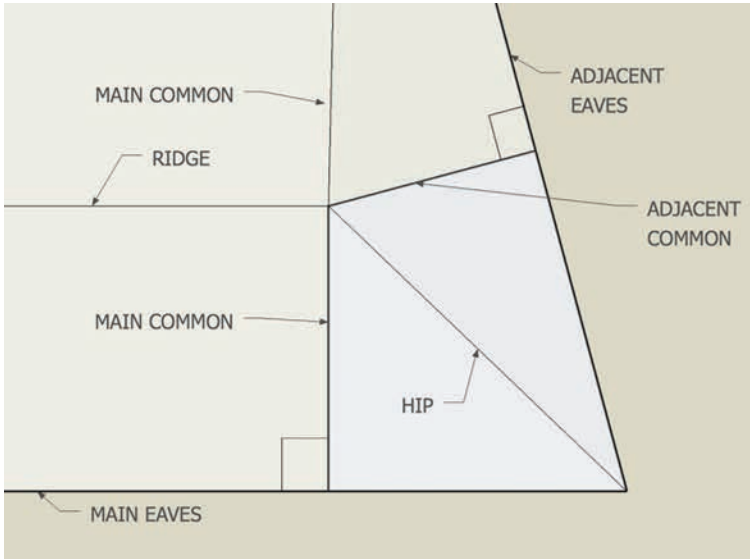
Plan view showing common rafters running at right angles to eaves.
